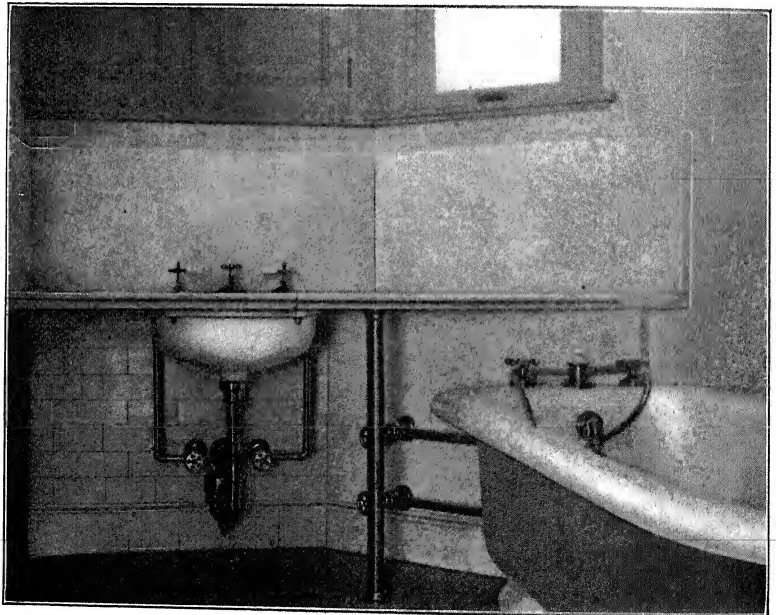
View of Bath Room Containing Bath Tub and Basin.
